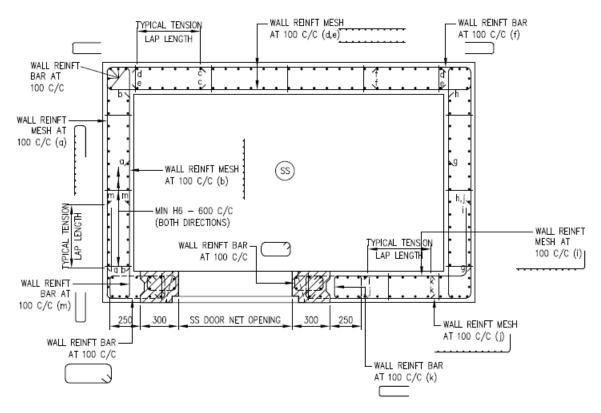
PLAN OF STAIRCASE STOREY SHELTER
